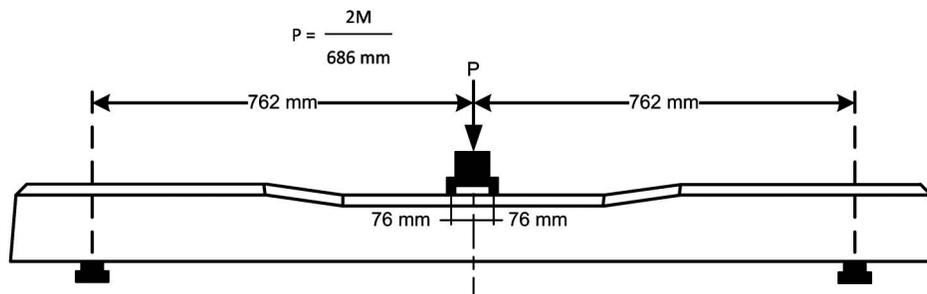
Positive center moment test configuration as outlined in AREMA 4.9.1, “Design test of monoblock ties” (data from AREMA 2009)
